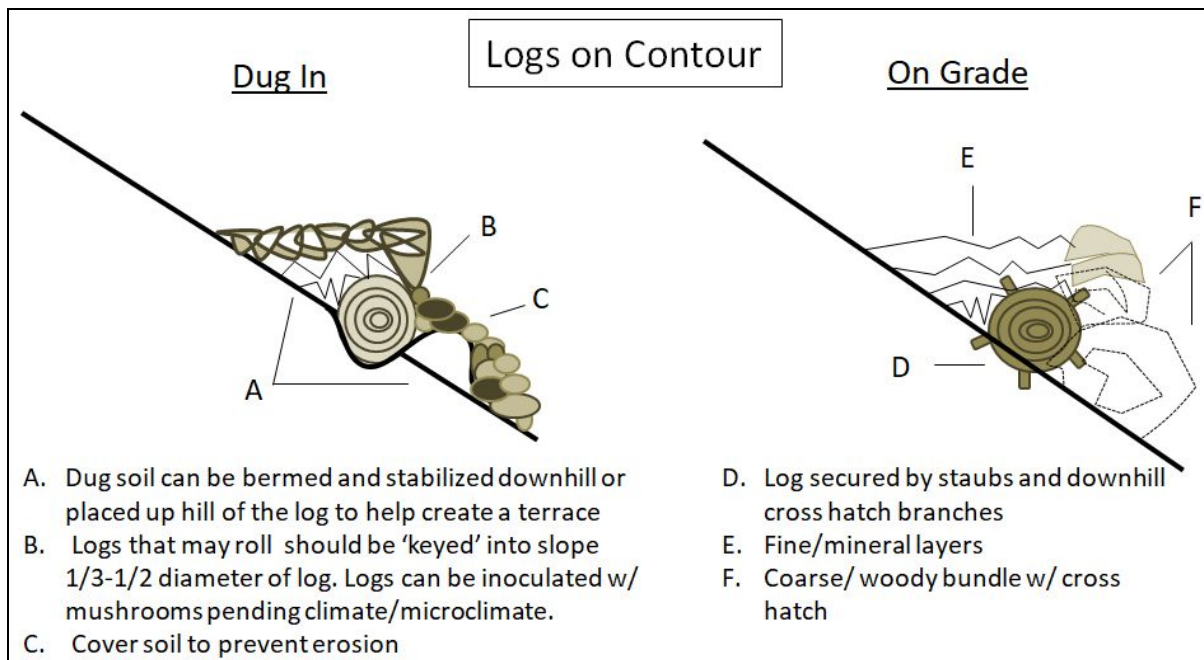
Logs can be used on sloped sites by keying them into the slope (left) or using a log with stubs and installing a stable cross hatching of branches to prevent rolling (right). Stubs are short lengths of branches left on the log lock the log into place.
